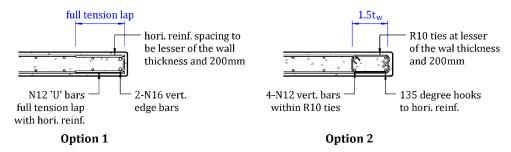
End region detailing for limited ductile walls in RC buildings with not more than four storeys.
